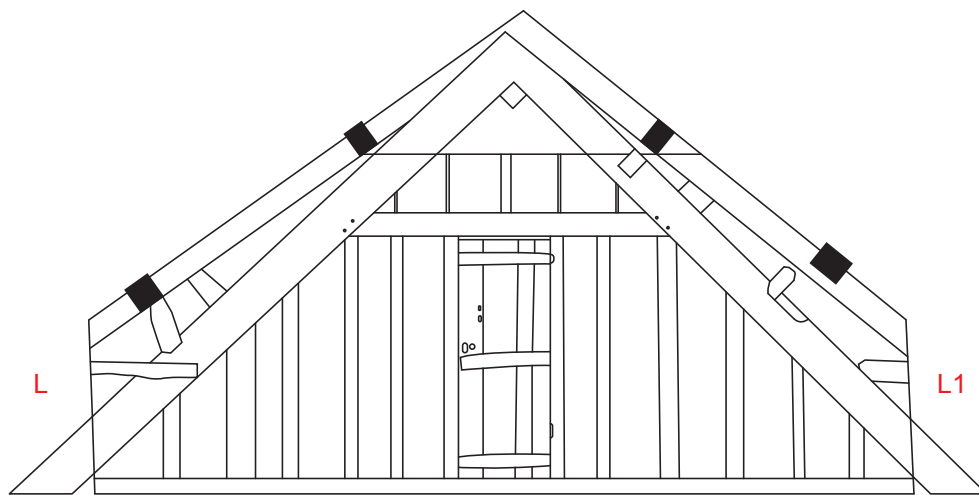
(right): South-west side of stud wall and truss, south-east elevation, Room A3
